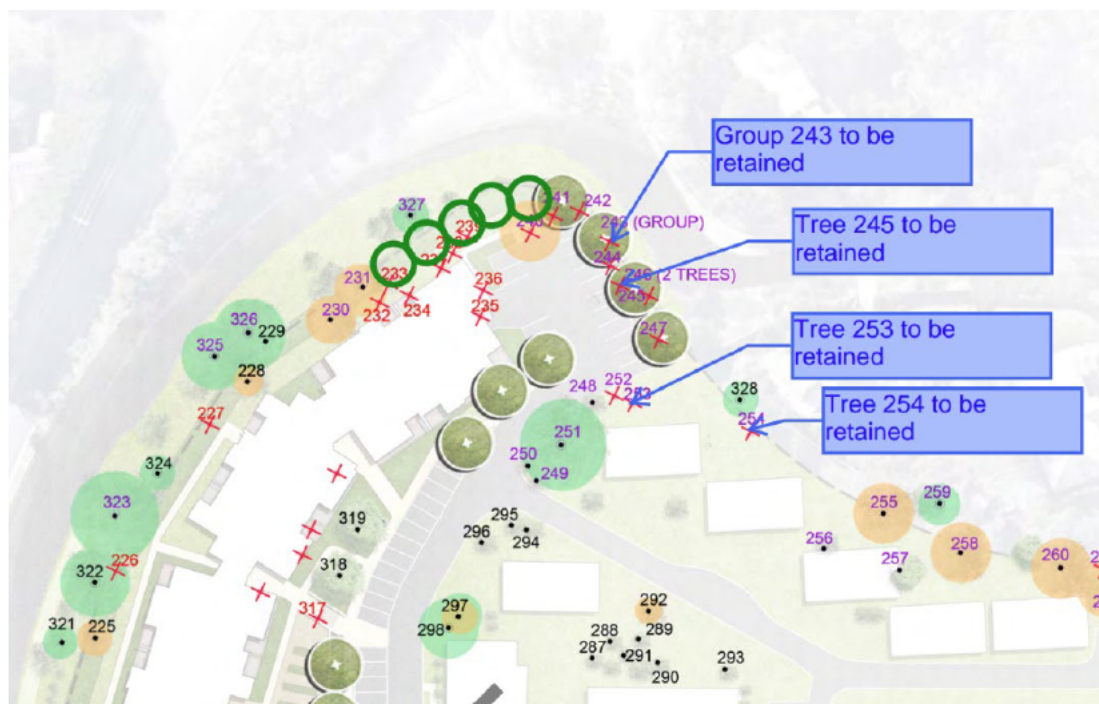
Excerpt of discussions plans demonstrating additional tree retention and planting proposed along the Overport Road/Sweetwater Drive intersection interface.
